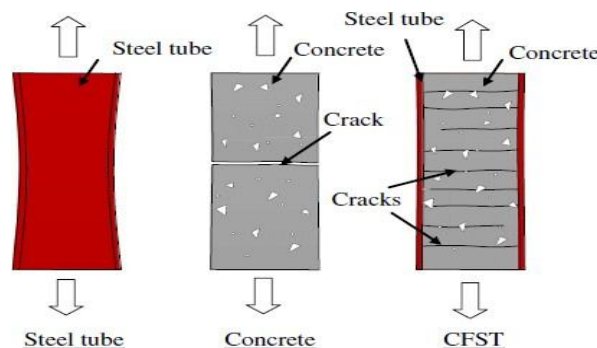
Failure modes of steel tube, concrete & CFST under axial tension
